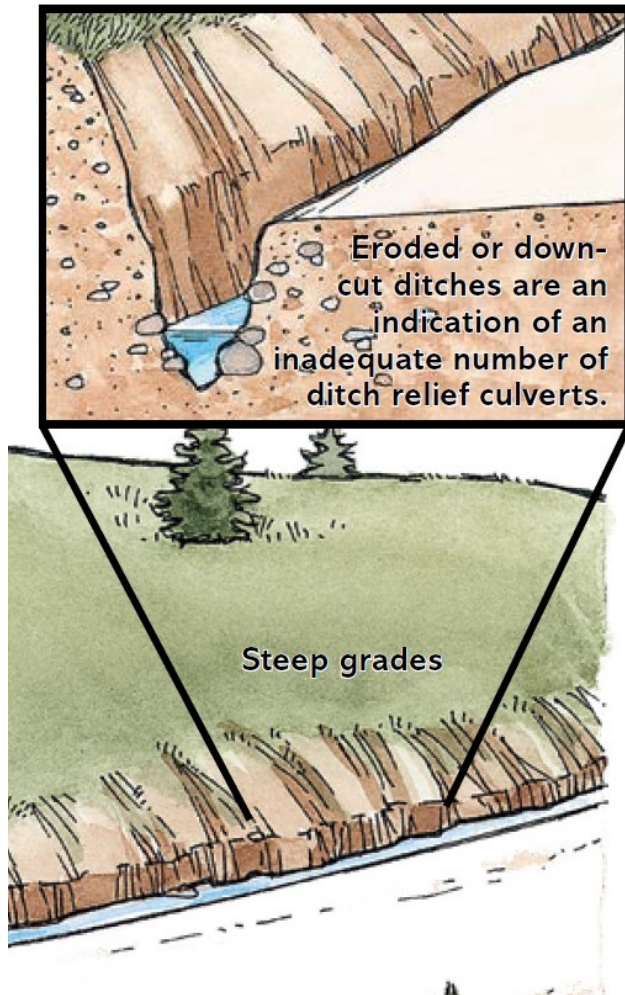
Erosion indication (A Guide for Forest Access Road Construction and Maintenance in the Southern Appalachian Mountains)
